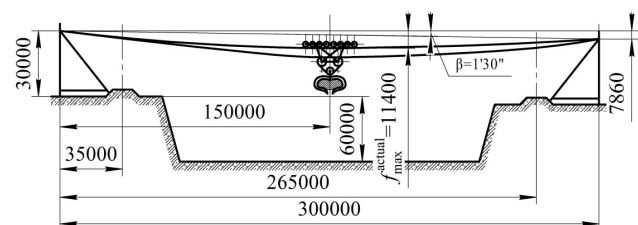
Dimensional drawing of an actual cable crane used for modeling
